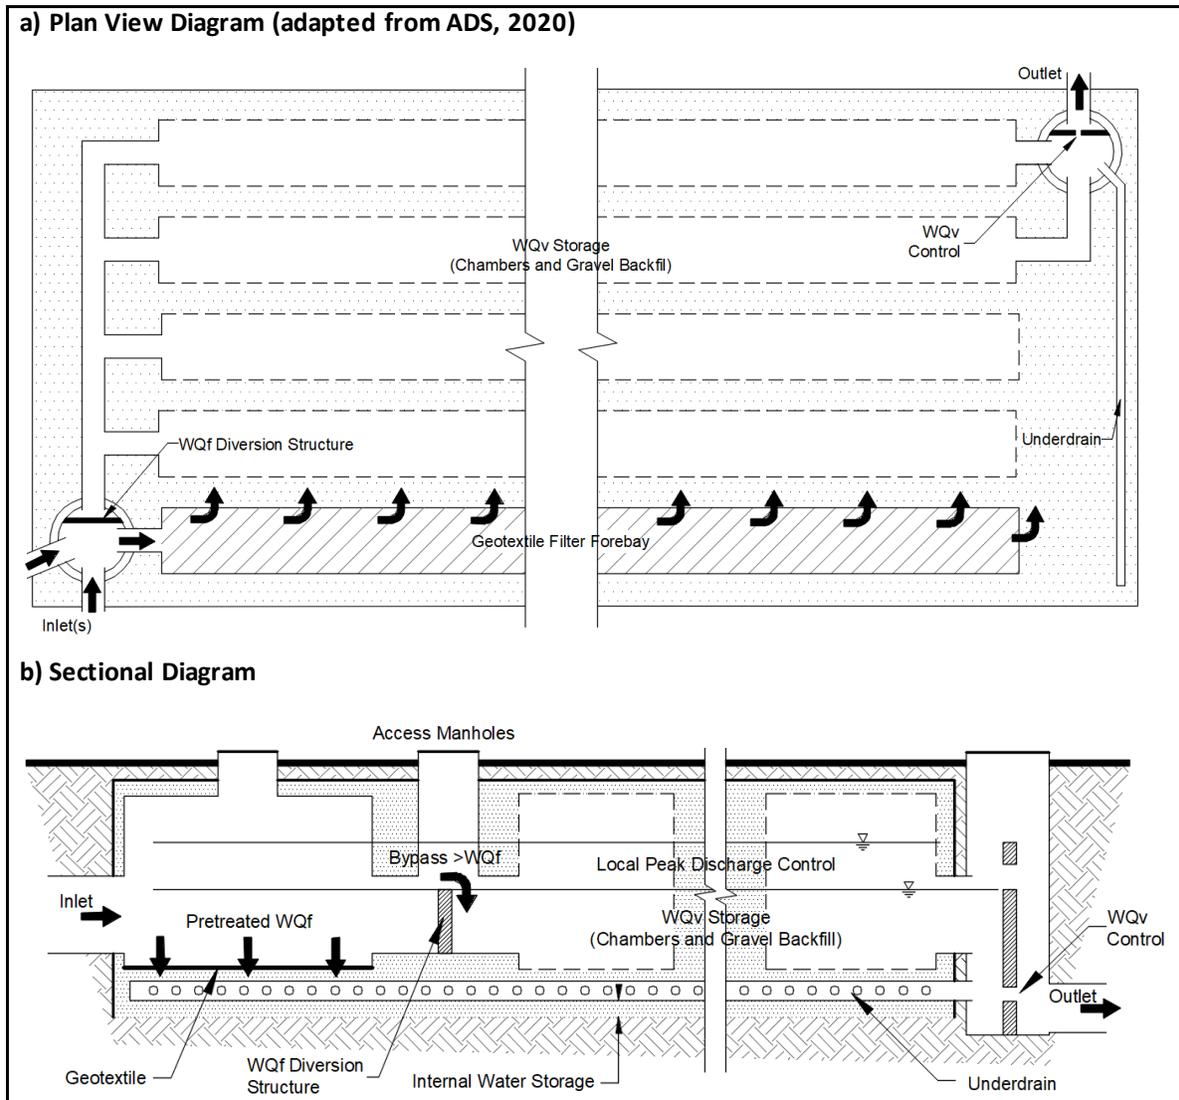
Conceptual illustrations of a geotextile fabric forebay as pretreatment for an underground storage facility with extended detention (not to scale).
